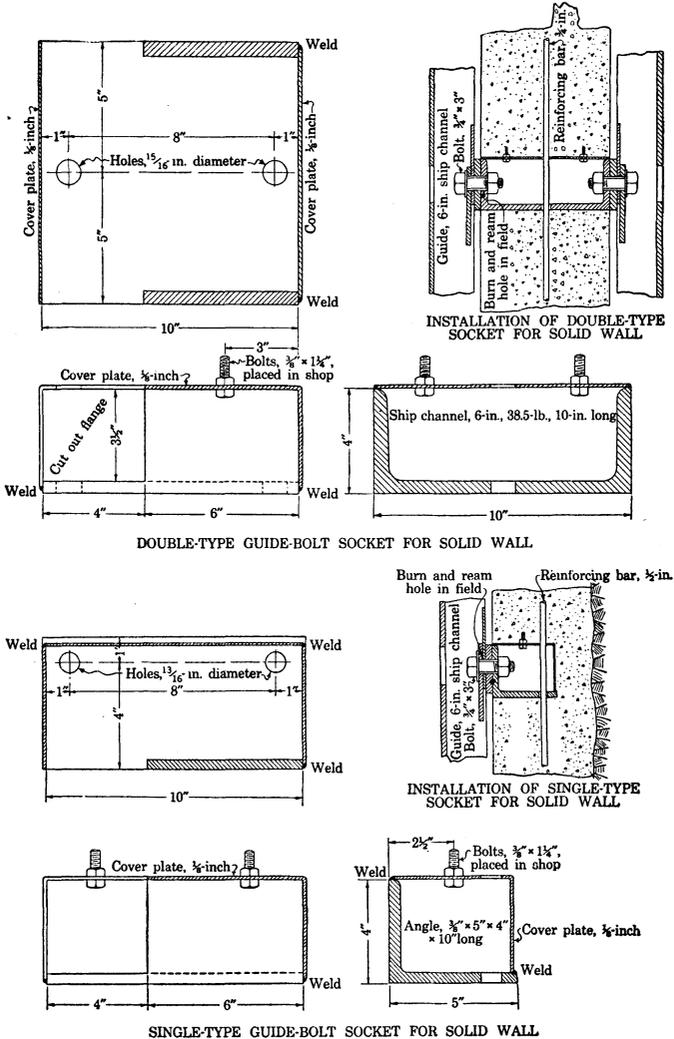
Bolt sockets for attaching guides, skip compartment, No. 7 shaft, United Verde mine
